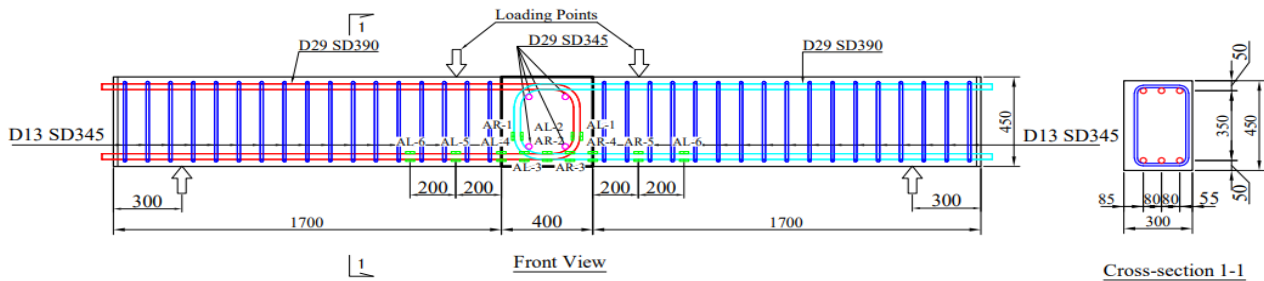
Precast beam in four point bending test showing loading condition, gauge locations, boundary condition and connection detailing.
